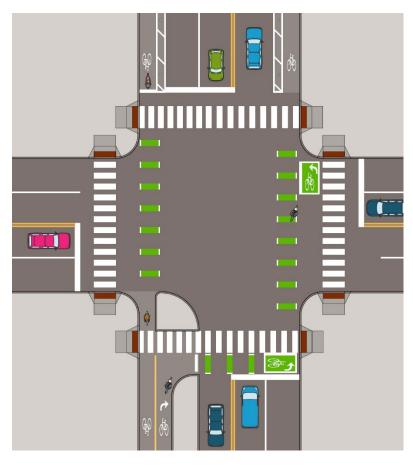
A two-way bikeway transition, similar to this, could be required at the intersection of School Street and North Main Street. Photo courtesy of the City of Minneapolis.
